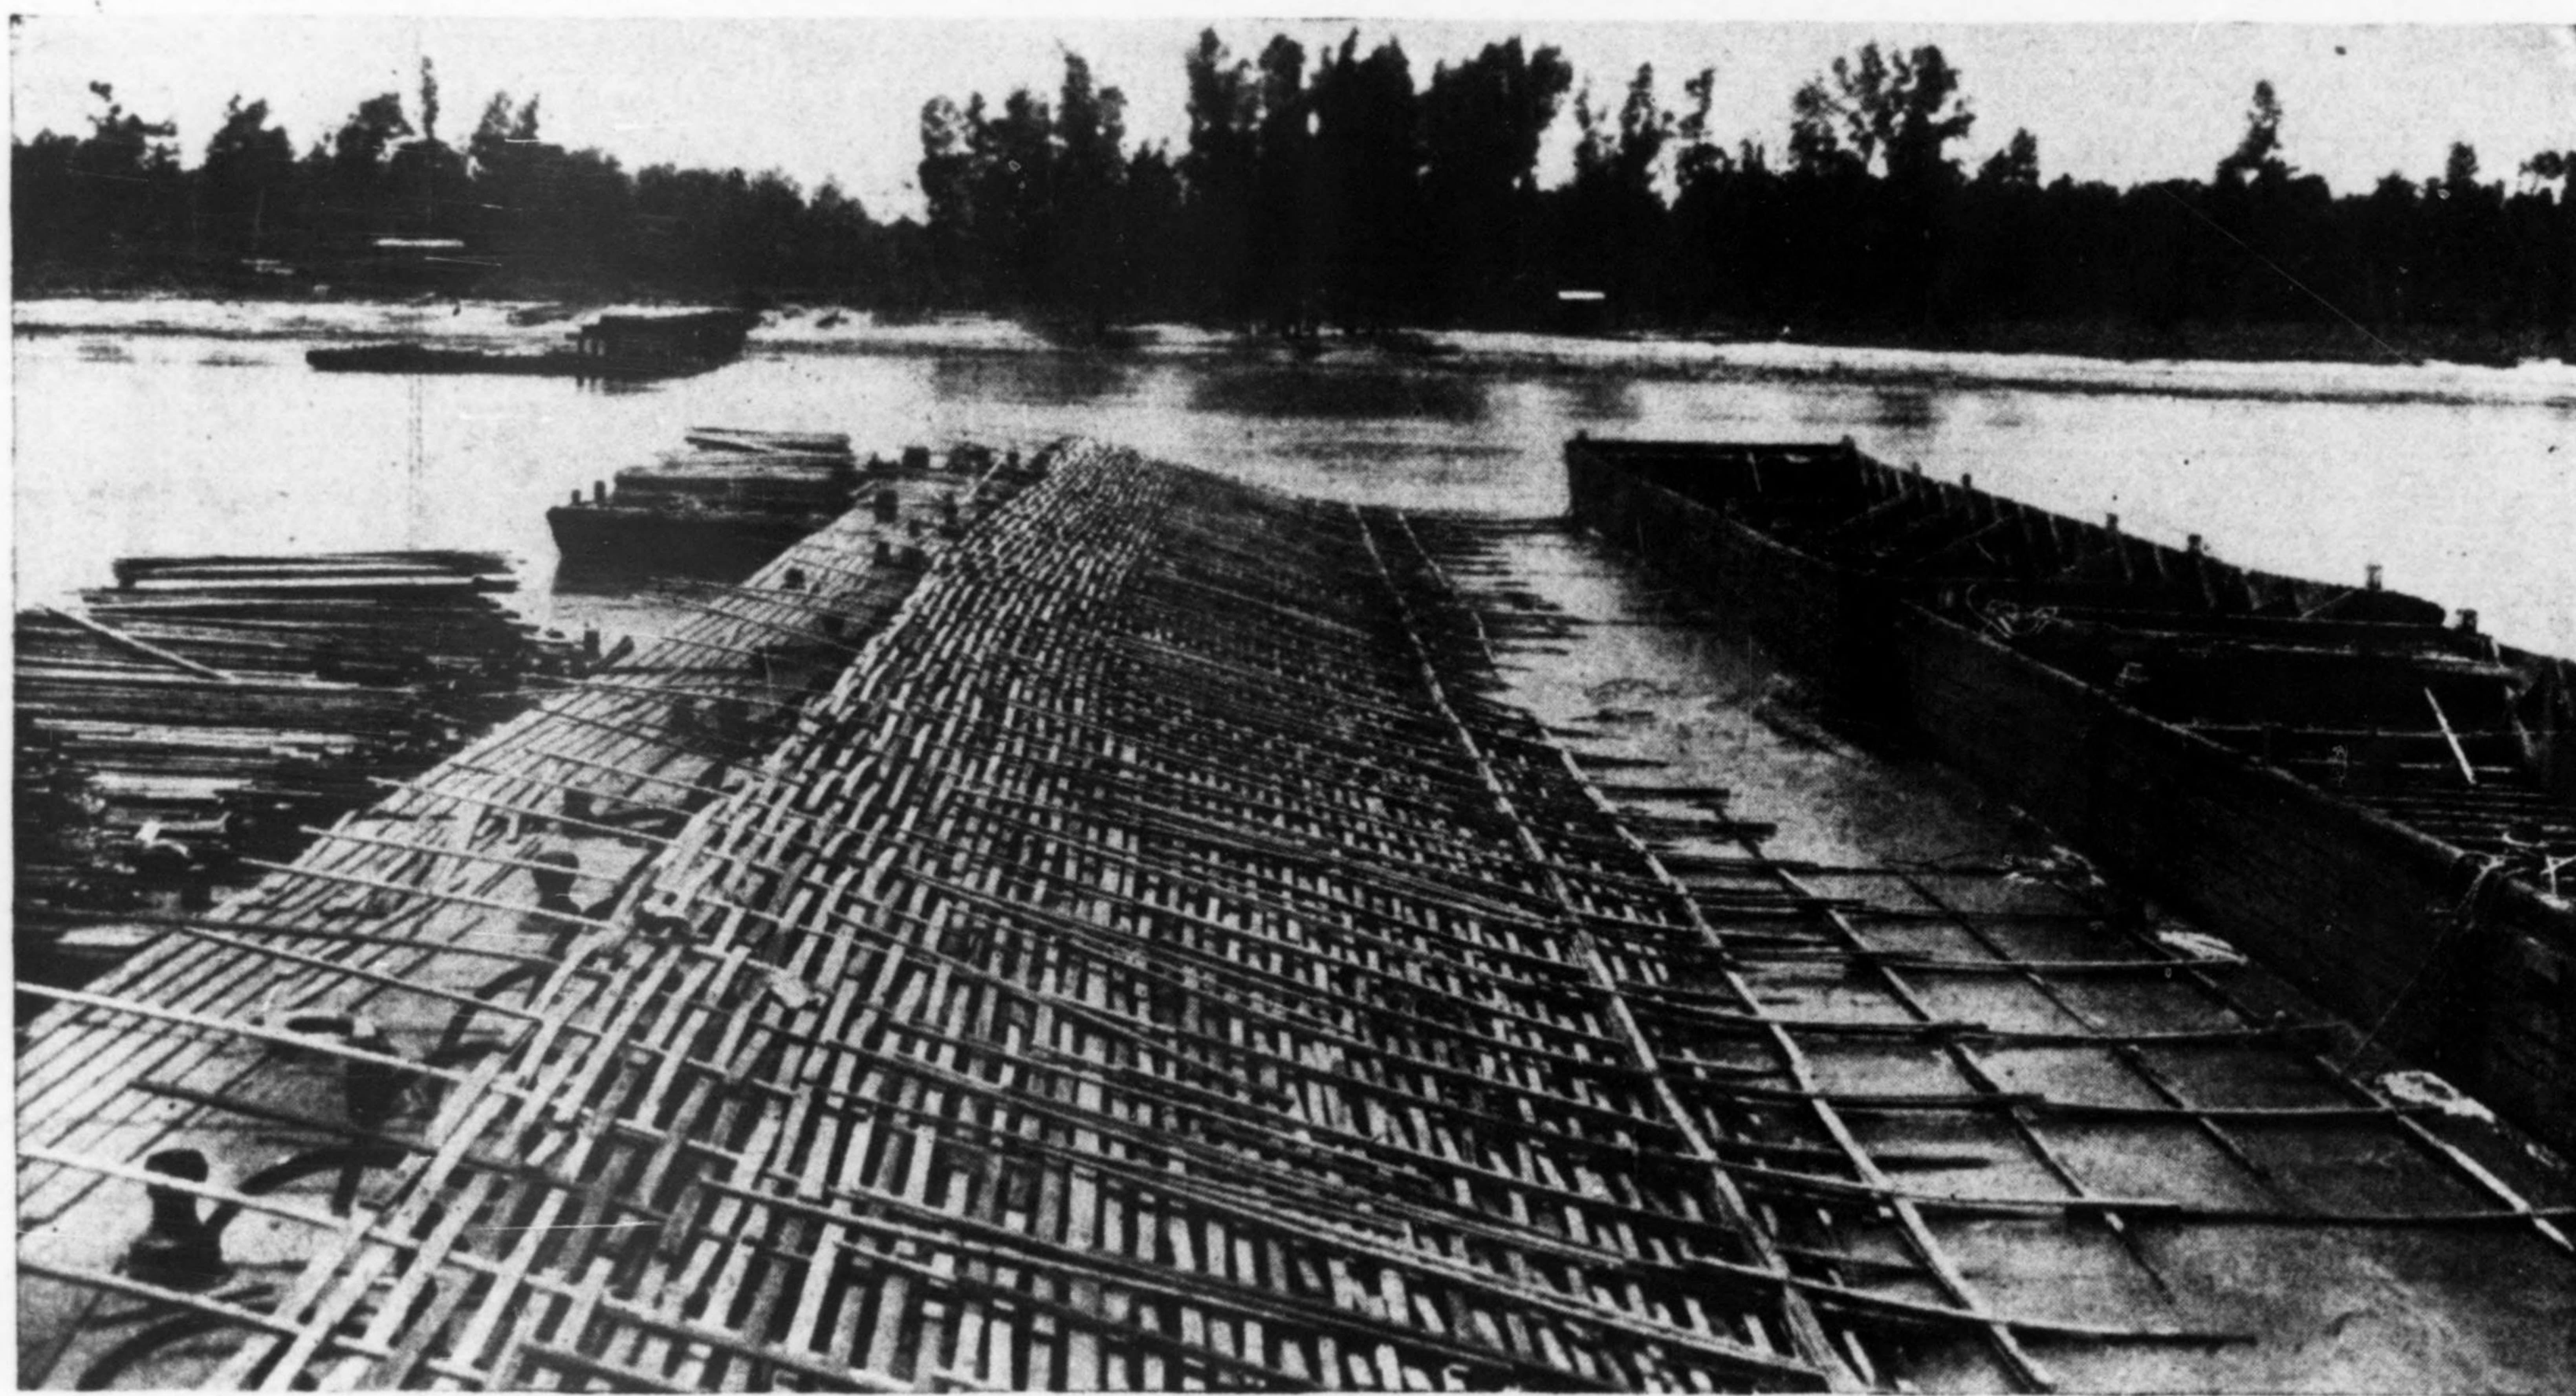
WEAVING ONE OF THE TIMBER MATS PLACED TO PREVENT SCOUR
